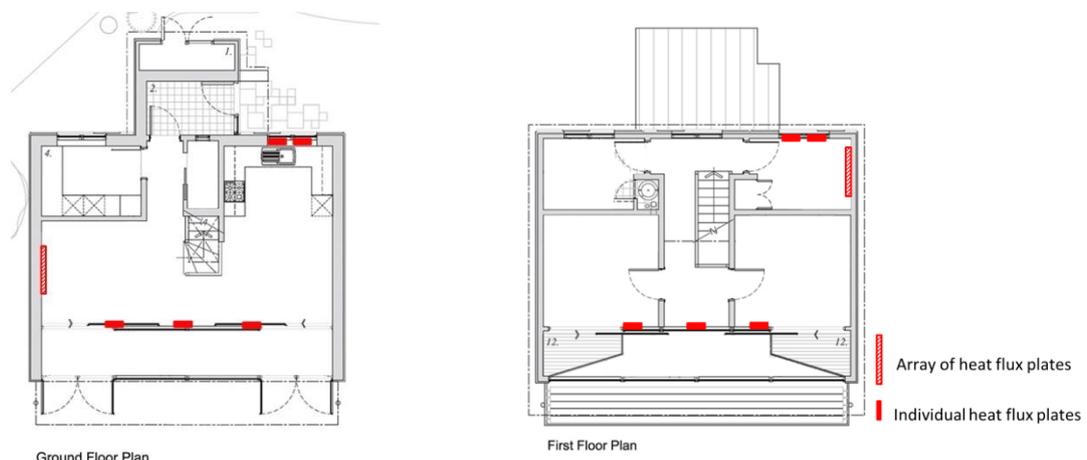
Ground floor (left) and first floor plan (right) of the test house and location of heat flux sensors
